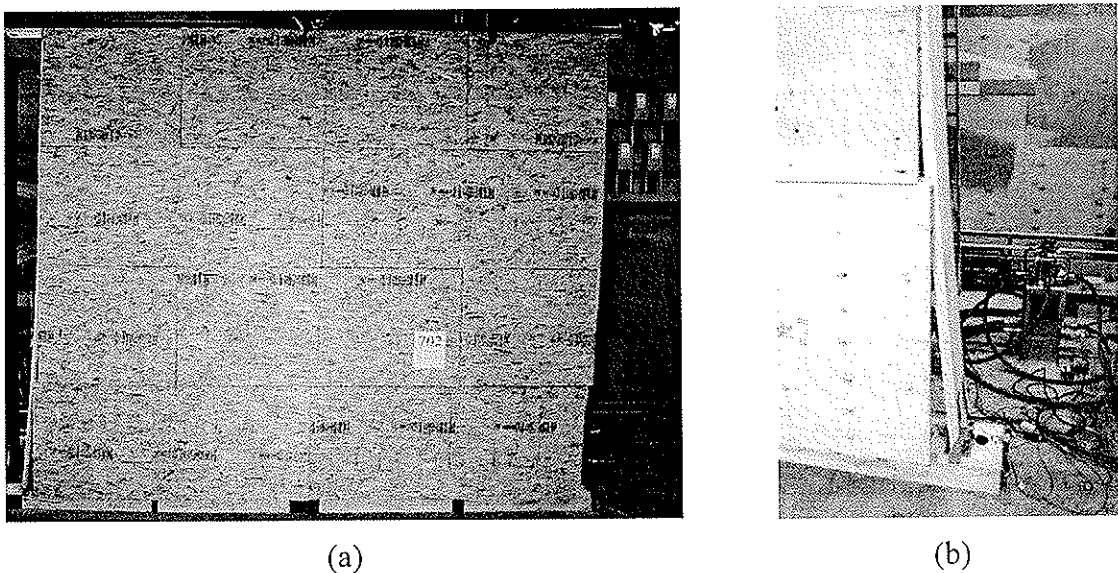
a) Typical deformed shape of the wall during the testing; b) Stud-to-sheathing failure along the bottom plate and along the sides of the wall.
